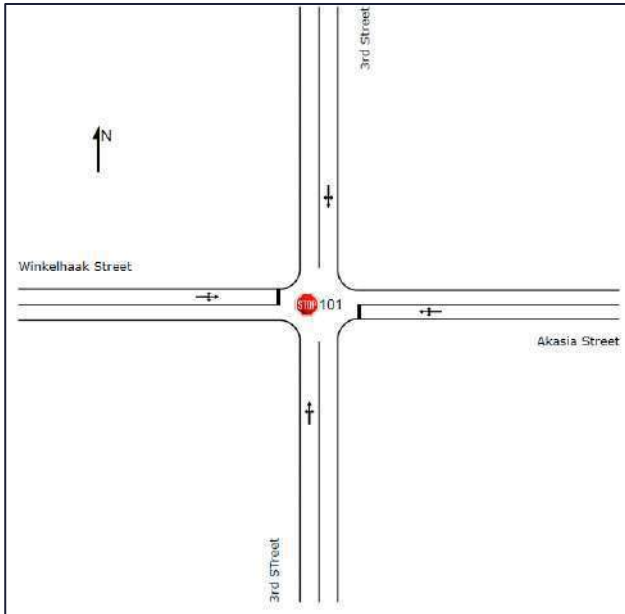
Existing Intersection Layout: 3rd Street, Akasia Street and Winkelhaak Street
